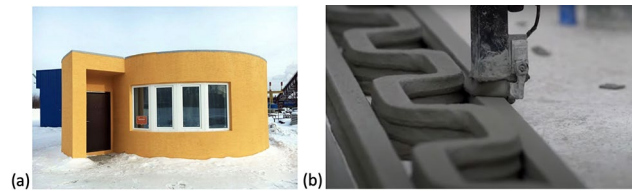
A sample of a contour crafted structure. a A 37 m² 3D printed residential home by Apis Cor. b Image showing the construction of the building using contour crafting. It was printed using a gantry system that printed the structure directly on-site in Moscow, Russia (Sakin and Kiroglu 2017)
